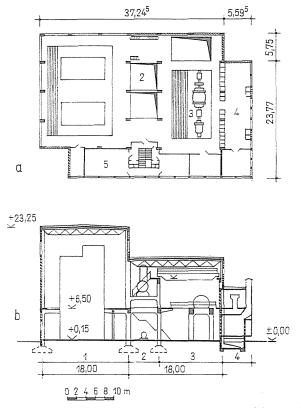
Plan of a sugar-factory power station: a - plan on a level of 6,50 m; b - cross-section; 1 - boiler house; 2 - feeding house; 3 - machine-hall; 4 - switch cupboard, transformer; 5 - foreman's office, dressing-room (on the ground-floor: water-softener, store, accumulator)
